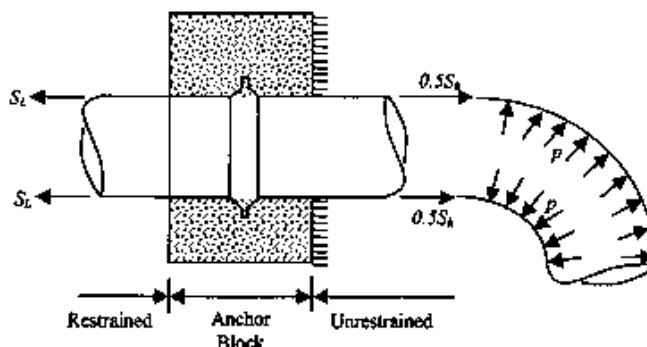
Anchor Force, from Anchor Installed to Limit Movement of Pipe. [3]
